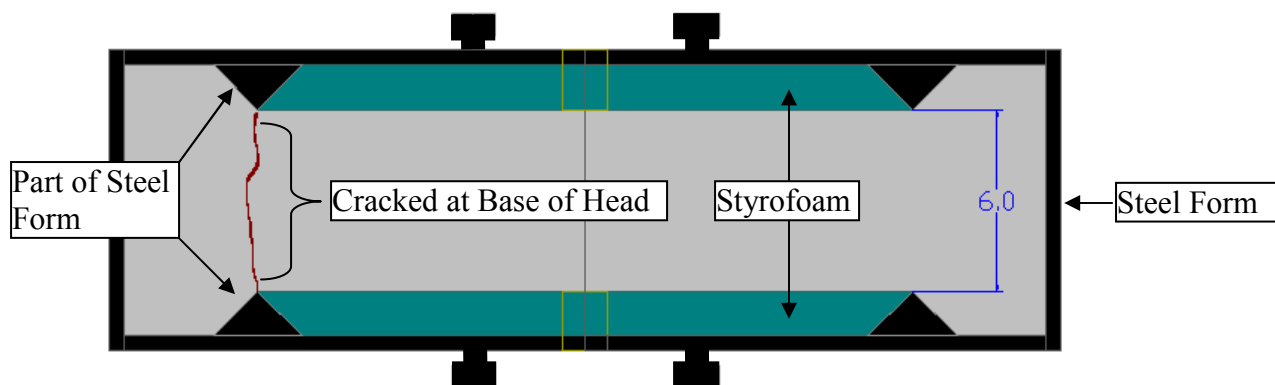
Original tensile wedge apparatus dimensions - top view without wedge
